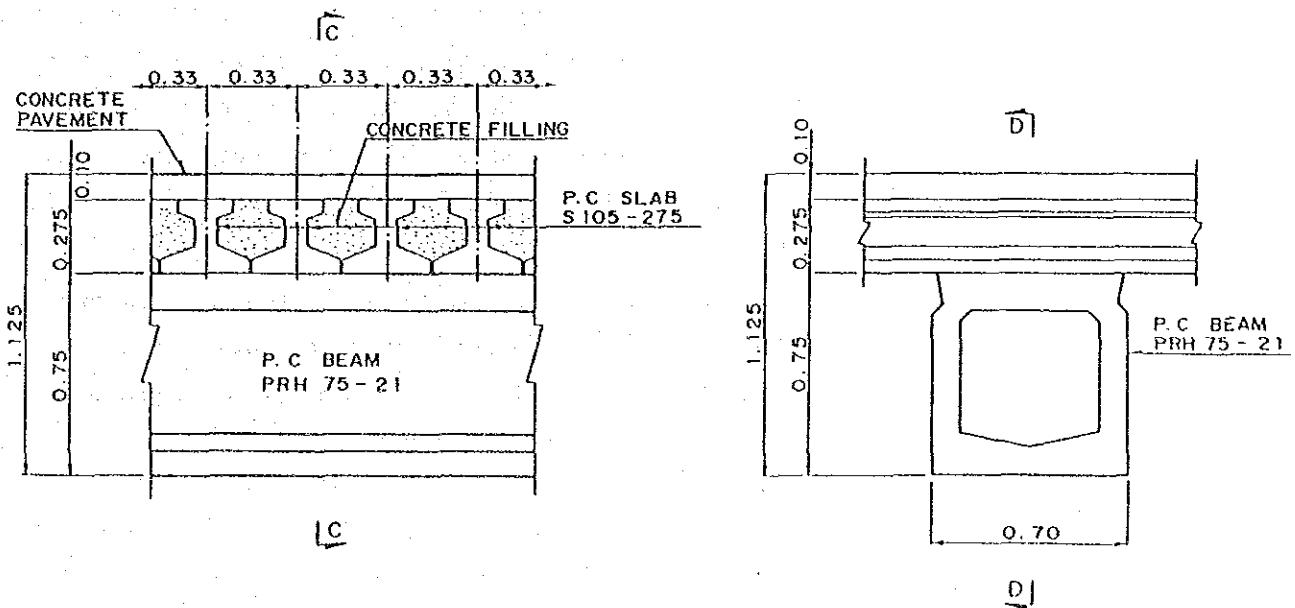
(c) Detail of Prestressed Concrete Beam
